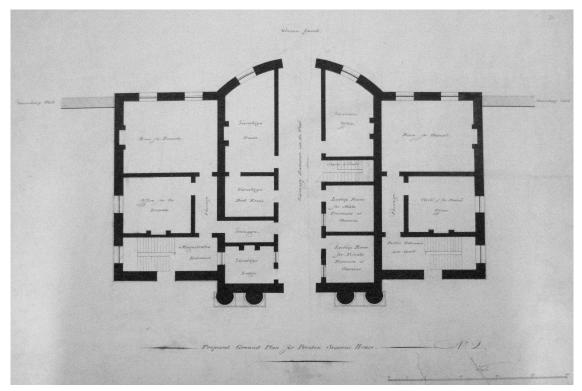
Proposed ground plan for Preston Sessions House, Thomas Wright, June 1824 (LRO QSV/12)
